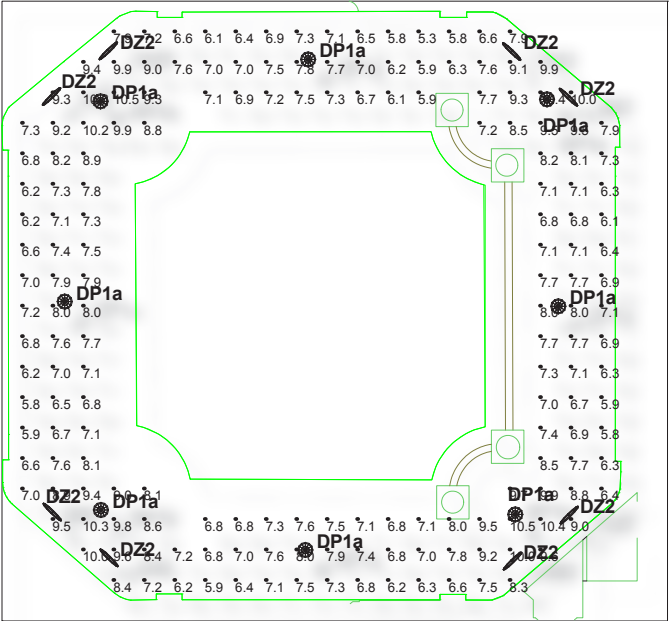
Lighting Calculation: First Floor South Private Office
